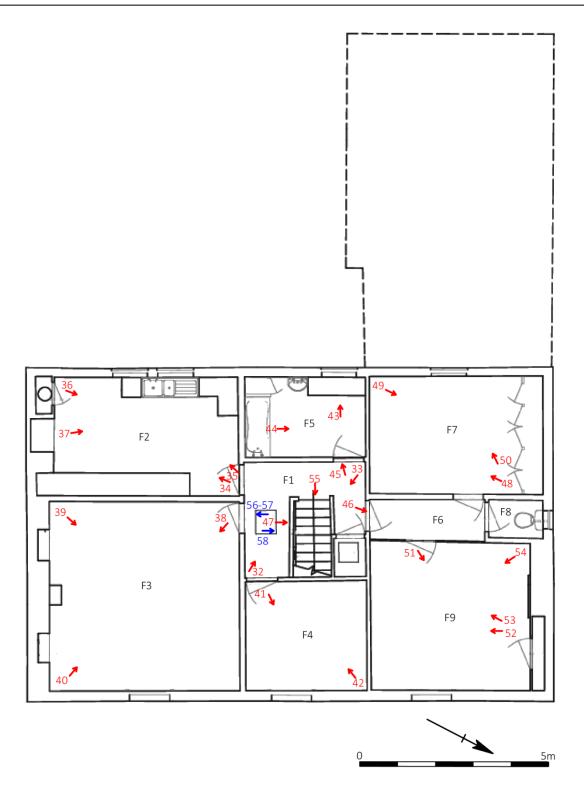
First floor photo plan (scale 1:100) (Photos of the roof space shown in blue)
